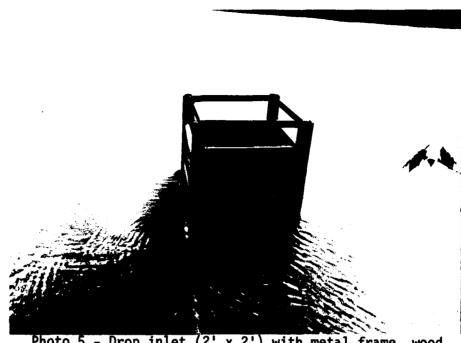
Drop inlet (2' x 2') with metal frame, wood slats and pipe for control mechanism, (May, 1980).
